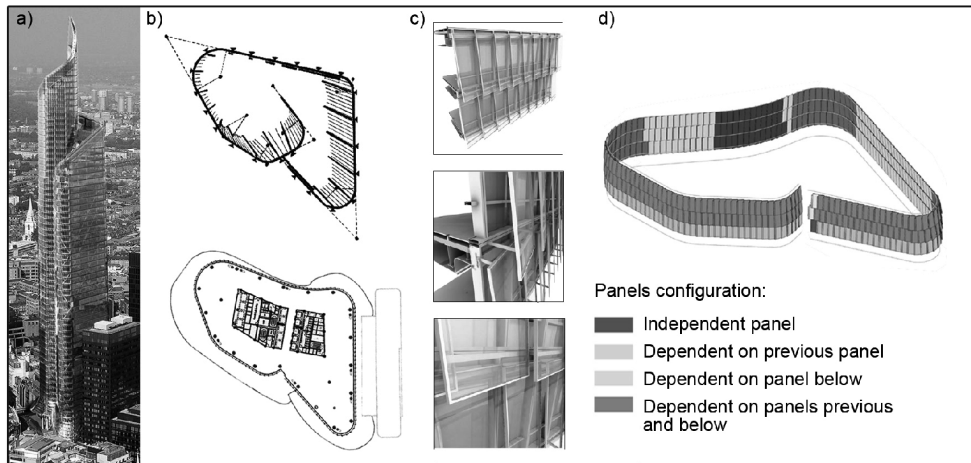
Bishopsgate Tower: a) a visualization; b) a diagram of the building geometry and a typical floor plan; c) a model of elevation – visualizations; d) a diagram of the elevation panels configuration
